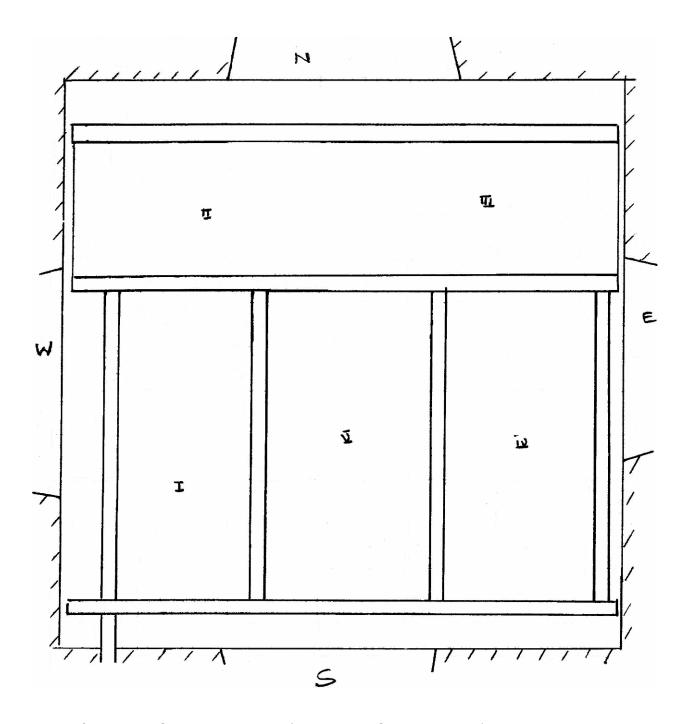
Thurlby Church; tower plan (provided by George Dawson)
